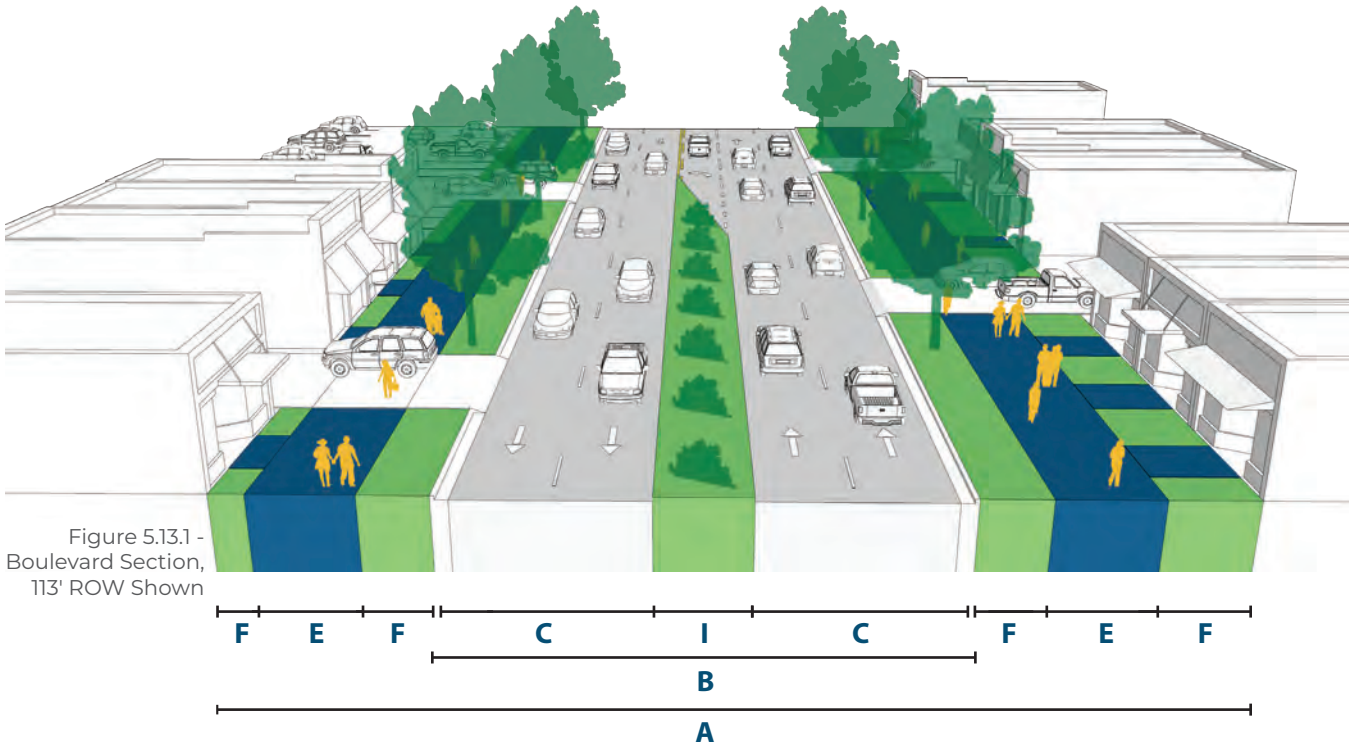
Boulevard Section, 113' ROW Shown
